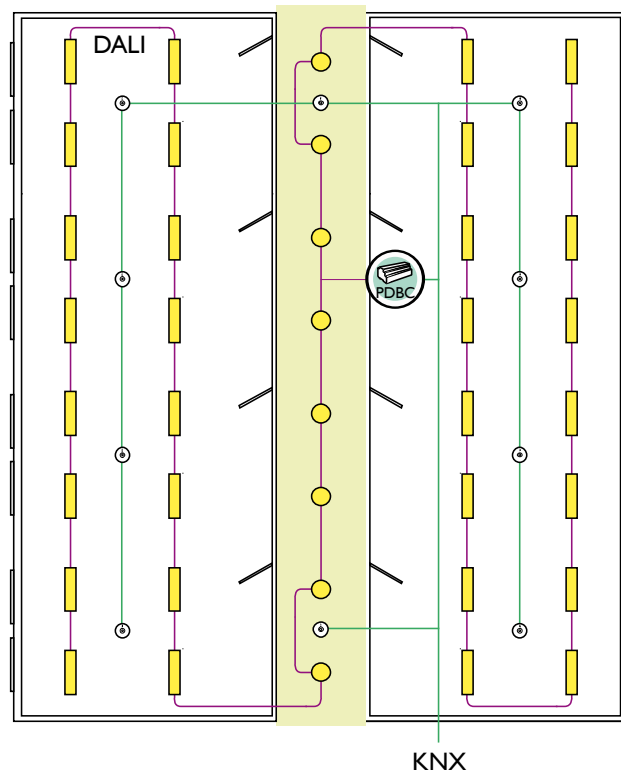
Example open plan office layout with DALI multi-master and KNX sensors
